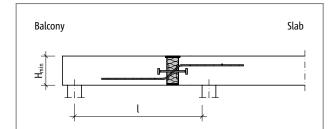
Schöck Isokorb® T type Q-P: Static system
